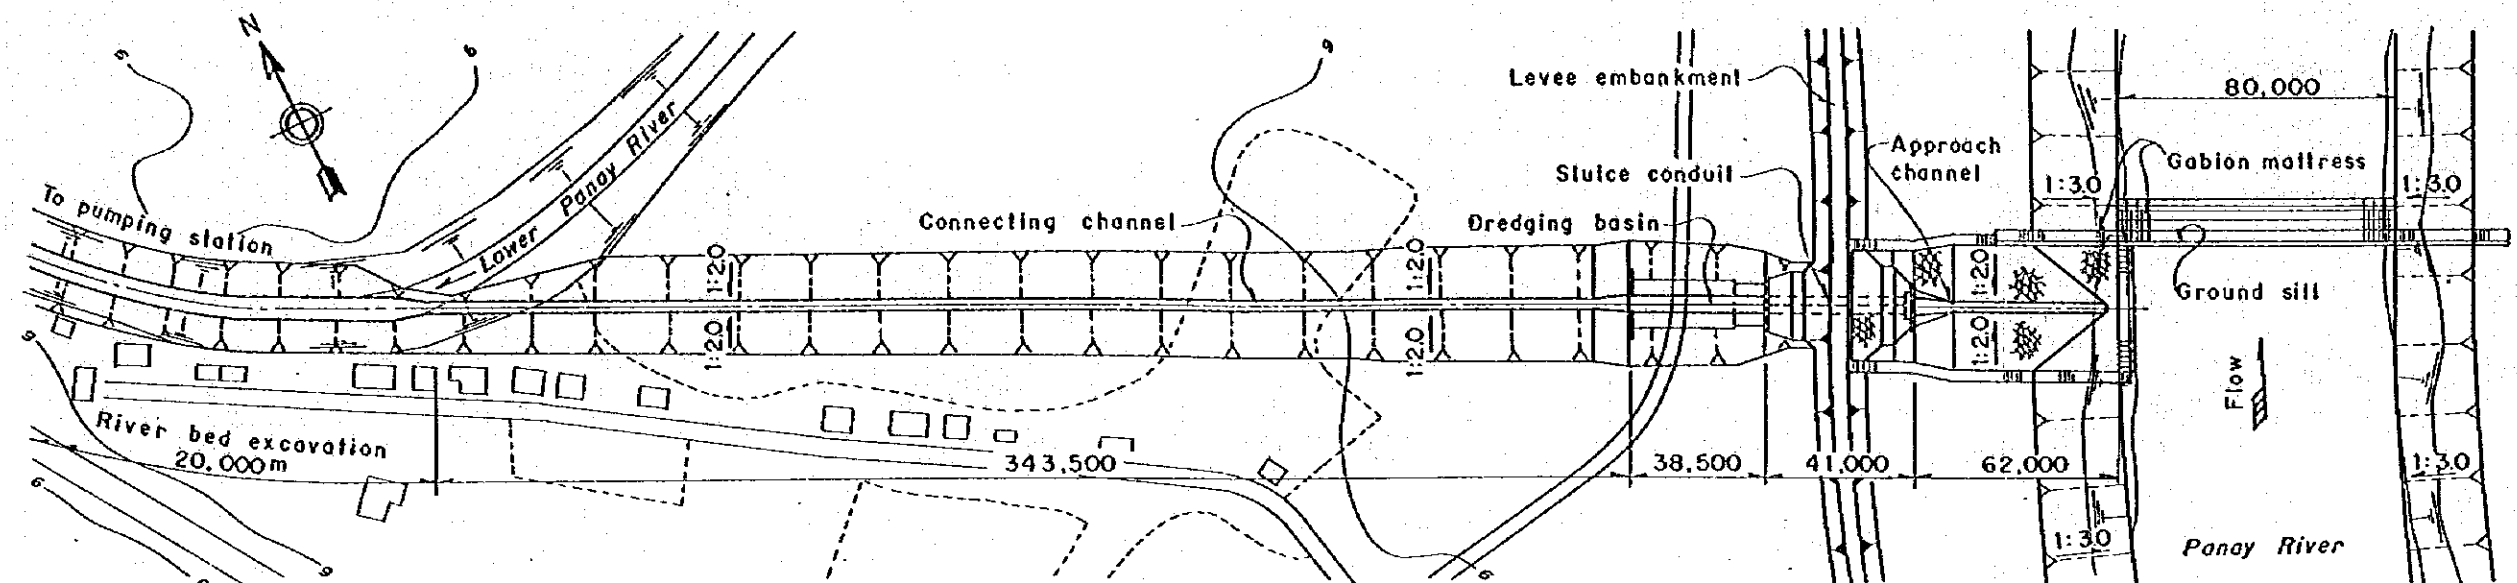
Alternative 3 : General Layout of Intake and Connecting Channel
